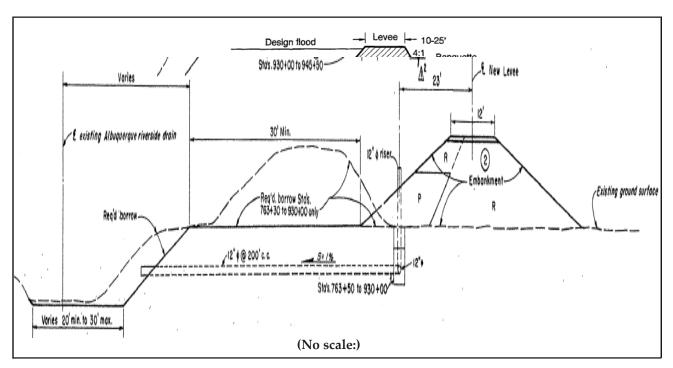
Typical levee section from the Albuquerque levees construction drawings
